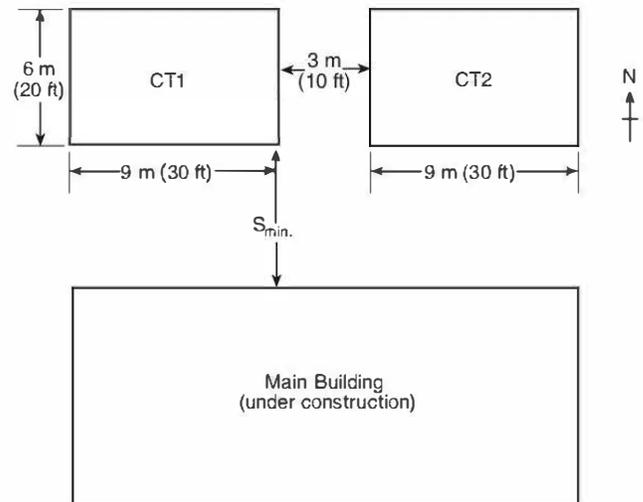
Example of Application of Note (1) to Table 5.2.1.
